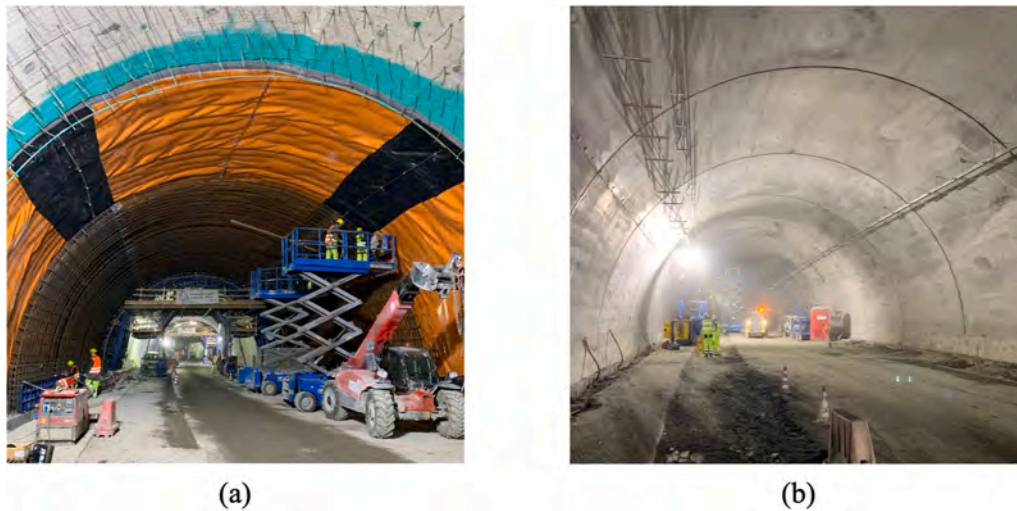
The Olimpia tunnel thermally activated portion after a) positioning the pre-assembled steel lattice ribs and b) casting in place the intrados shell.
